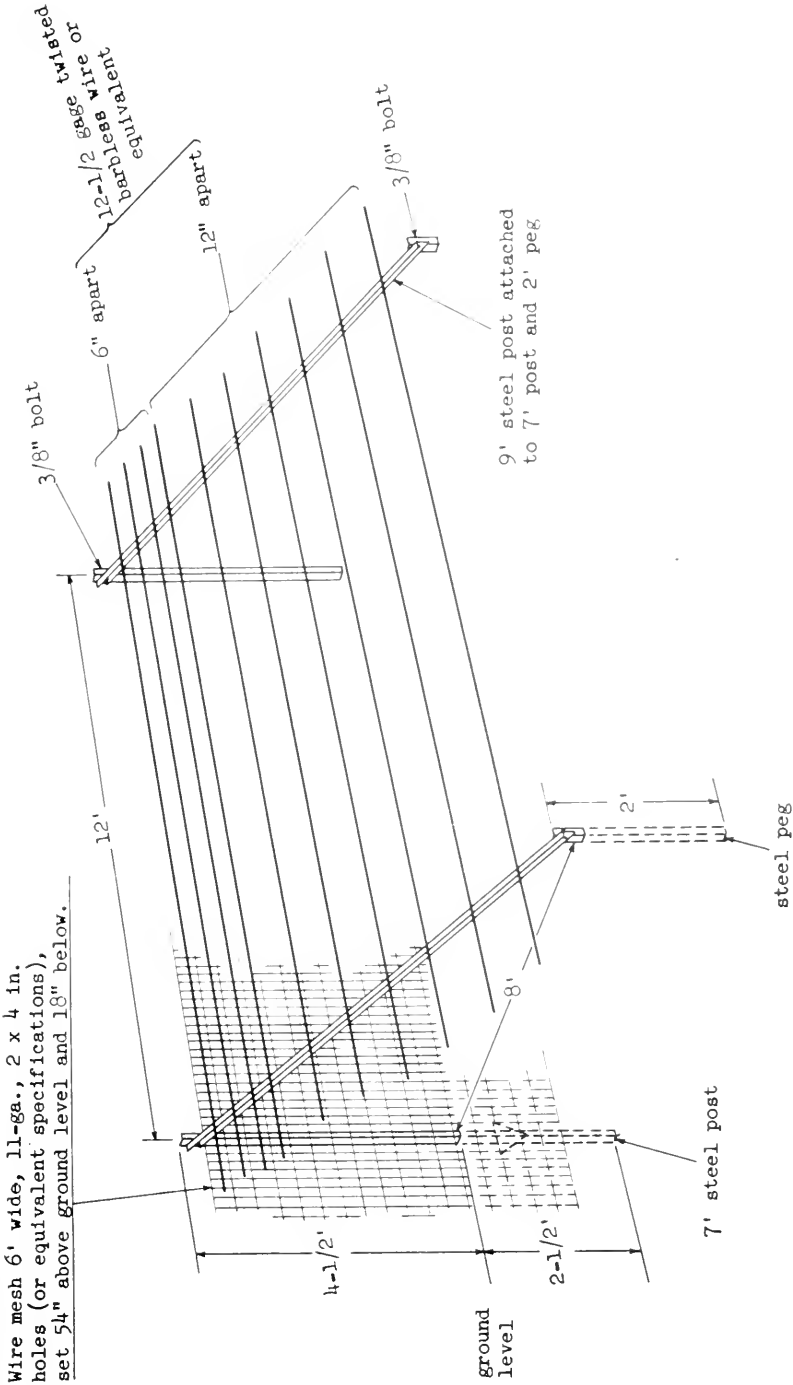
Drawing of outrigger type deer fence, showing construction details. Design by A. L. Hormay.
